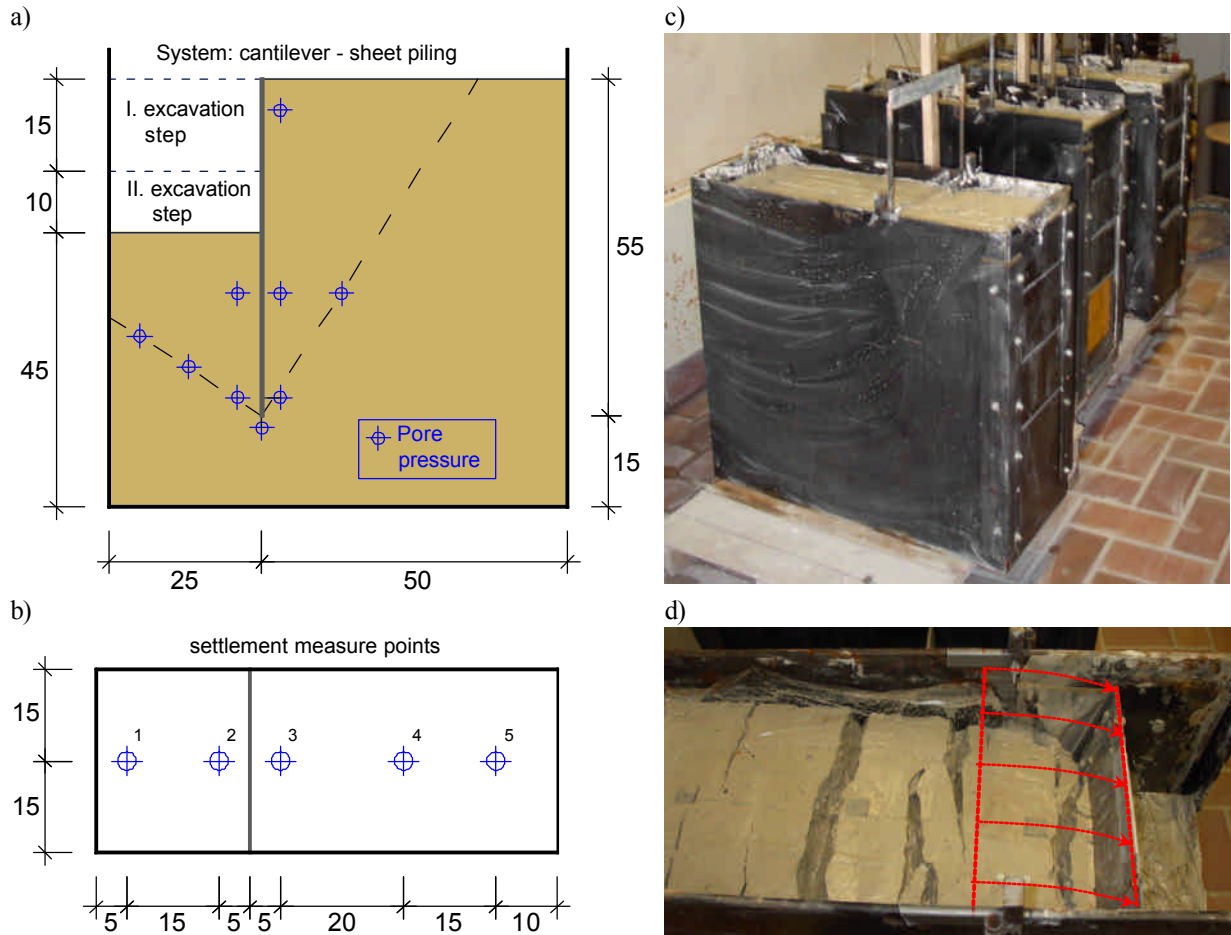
Small scale model test cross section (a) and horizontal projection (b) with points of measurement, cantilever test series before (c) and after (d) excavation
